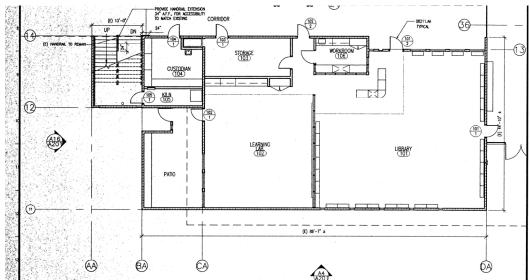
BUILDING 2: 1998 Modernization 1st Floor Plan
